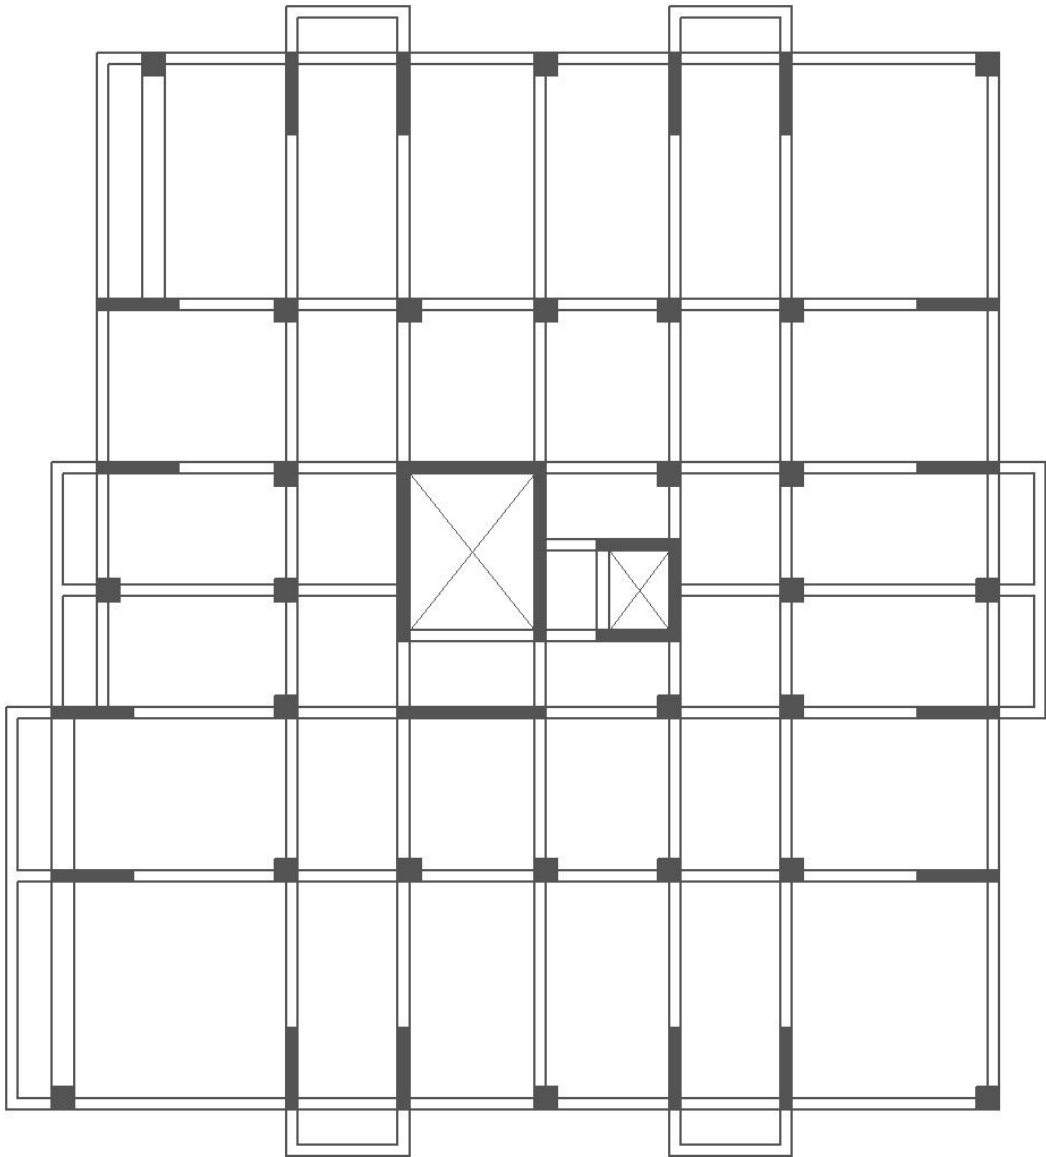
Structural Plan of Model-3 with Regular Structural System
